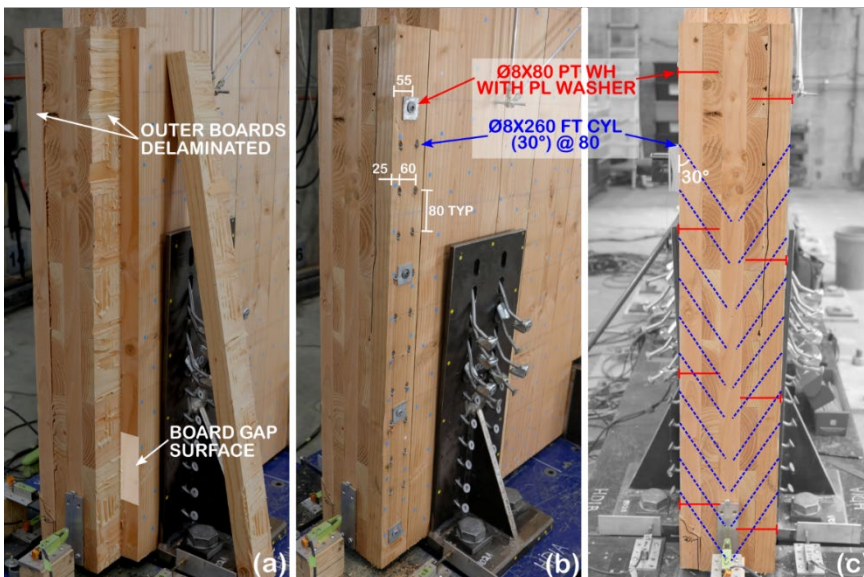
Repair method for delamination at CLT wall toe: (a) delaminated state, (b) isometric, and (c) elevation view of screw reinforcement.
